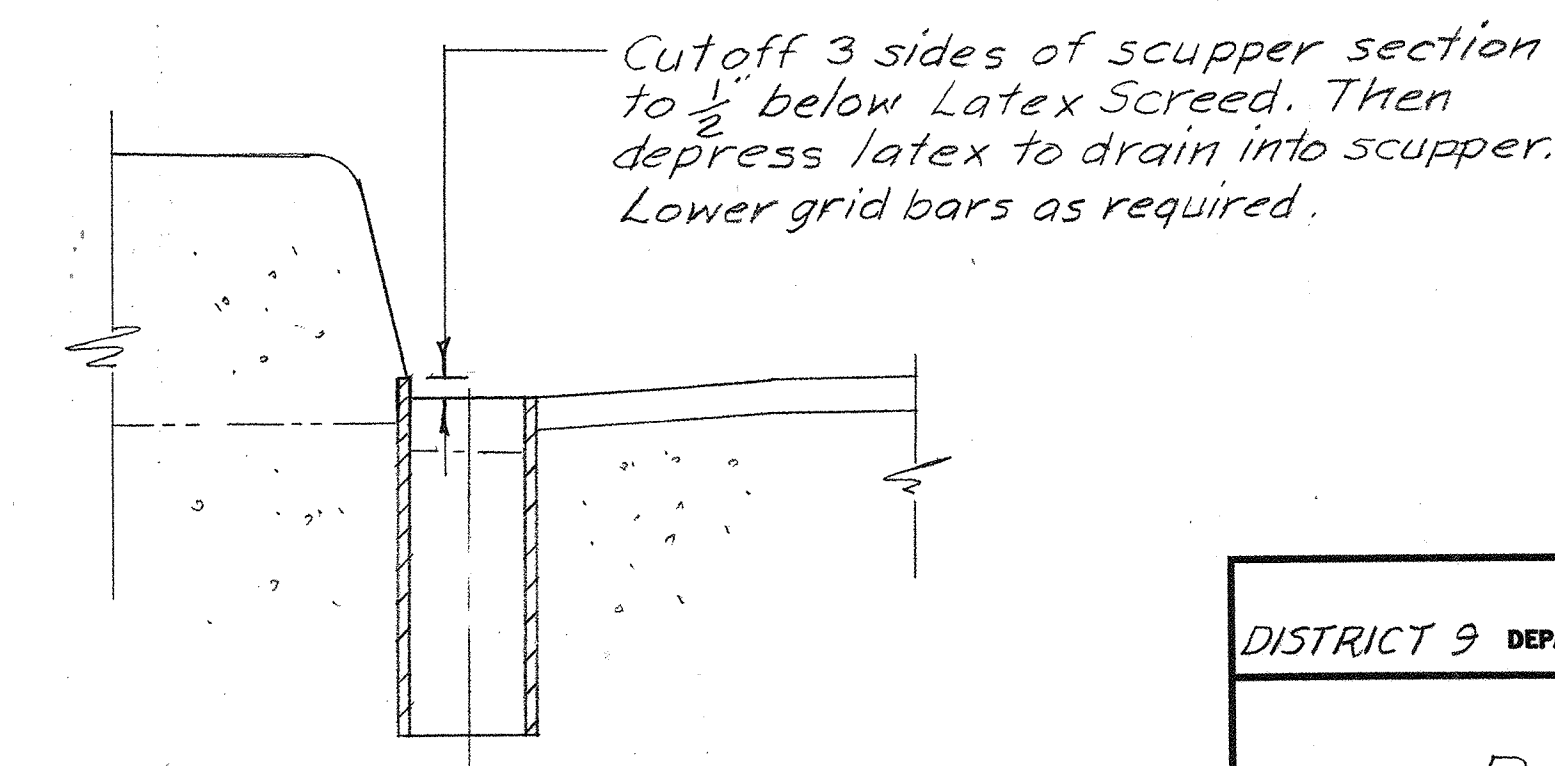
DETAIL - DRAIN PIPE ASSEMBLY REPLACEMENT & REPAIRS.
